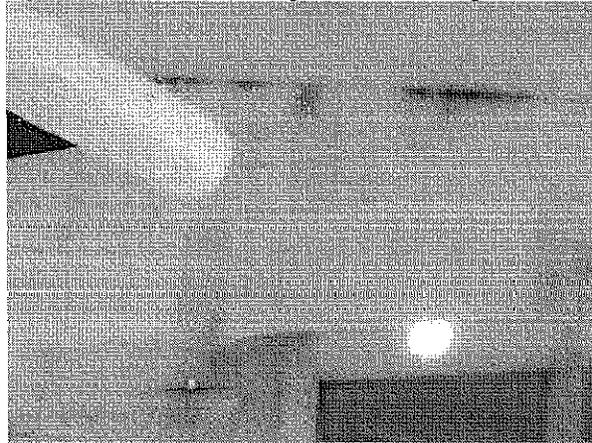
Infrared showing air leakage at windows and wall-to-ceiling transition and possible moisture loading in wall
